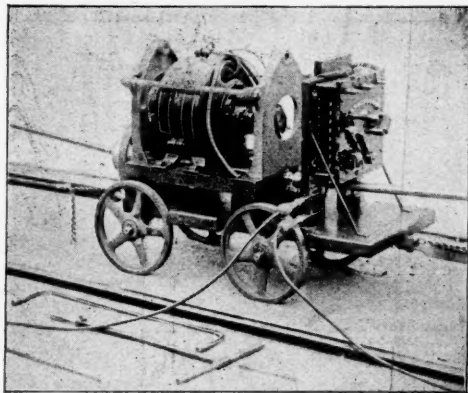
Motor Mounted to Drive Drills for the Harrington Rail Bond.
